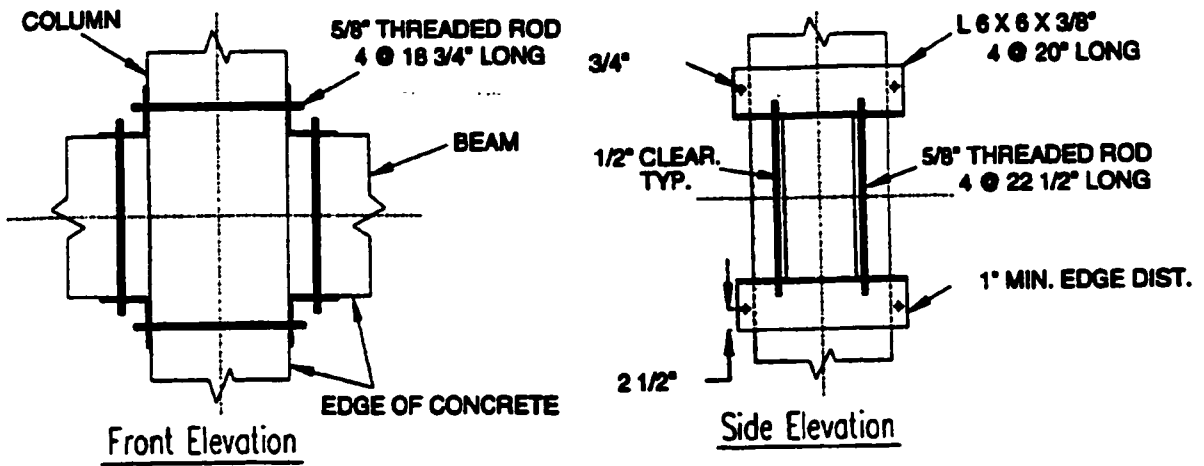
Retrofit strategy, concrete encased connection (Roeder et al., 1994)
